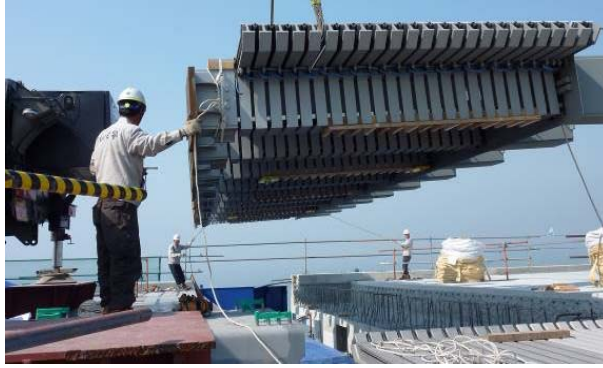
Installation of a Tensa-Modular expansion joint in a concrete bridge deck
